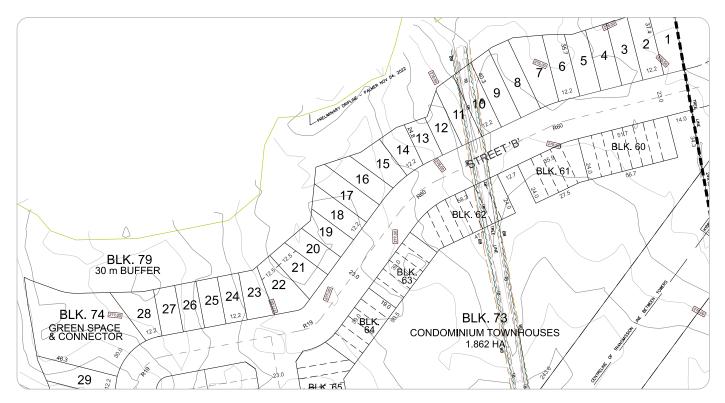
Proposed Single Detached Lots (Draft Plan Prepared by Weston Consulting)
